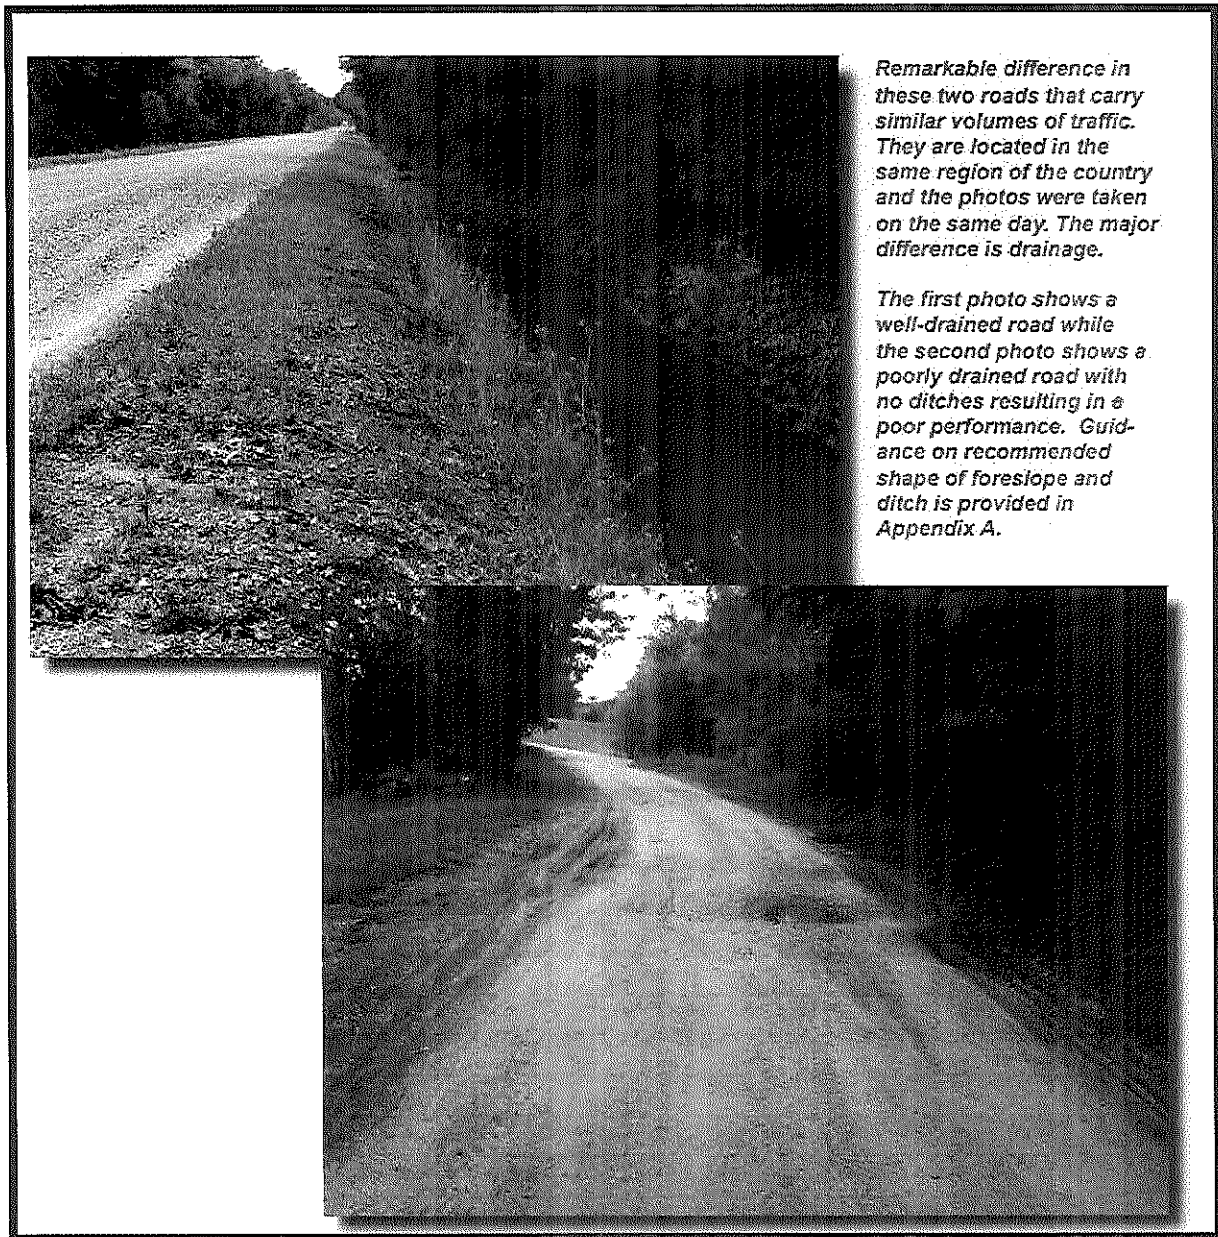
Excerpt from FHWA “Gravel Roads Construction and Maintenance Guide” on Drainage <sup>4</sup>
